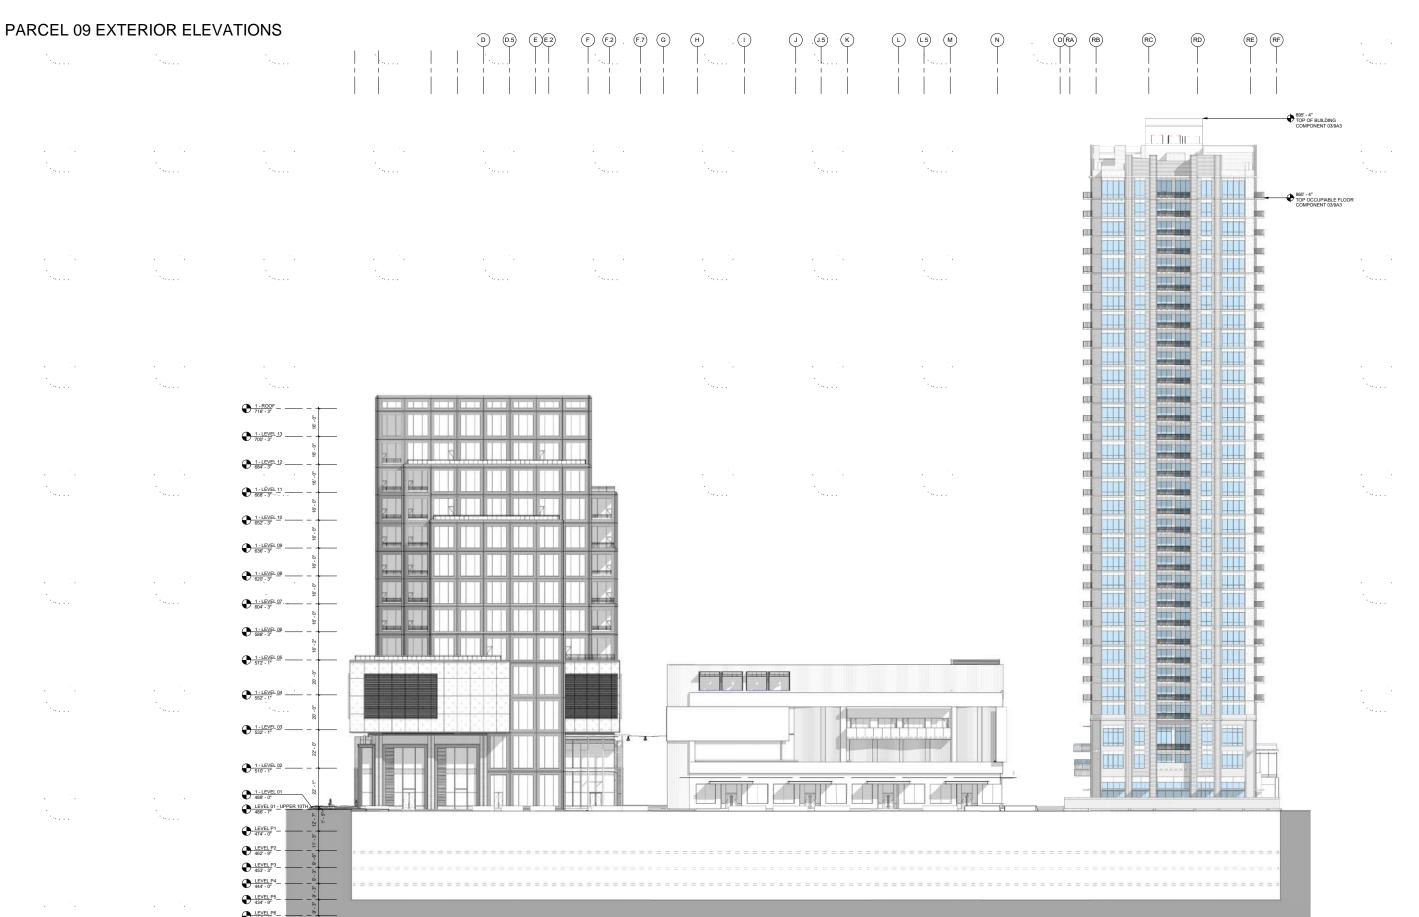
### EXHIBIT A: MASTERPLAN FOR NASHVILLE YARDS
